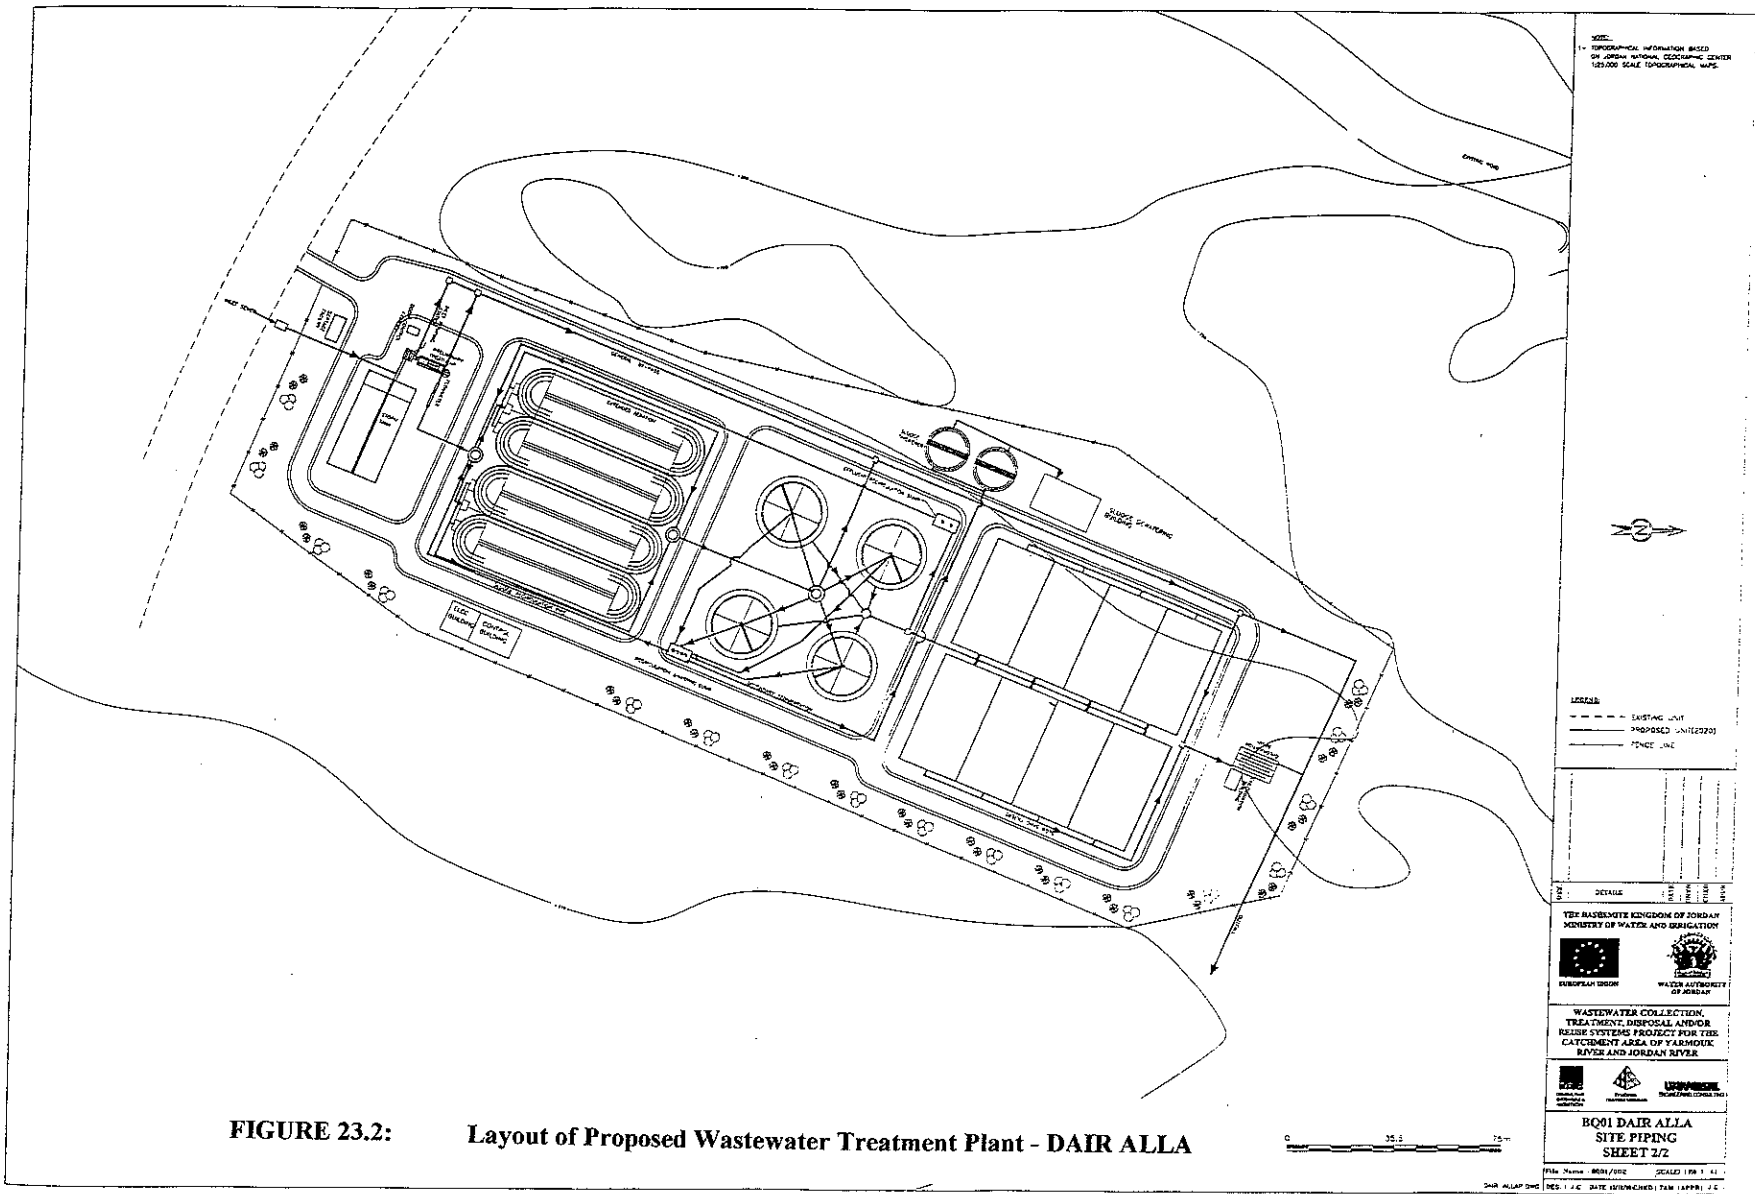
Layout of Proposed Wastewater Treatment Plant - DAIR ALLA
